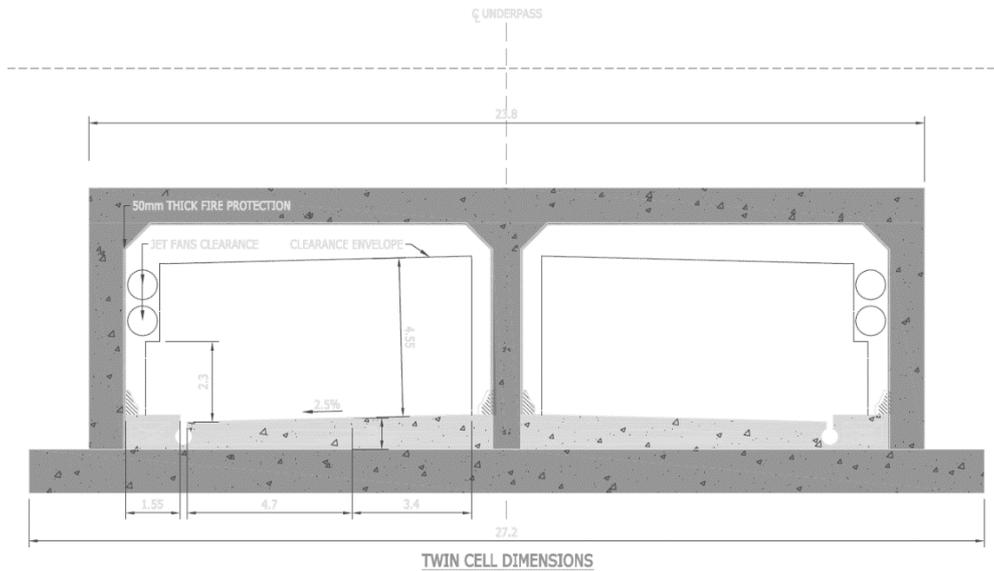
Typical Cross-Section of Twin Cell Tunnel – West Apron Vehicle Underpass
